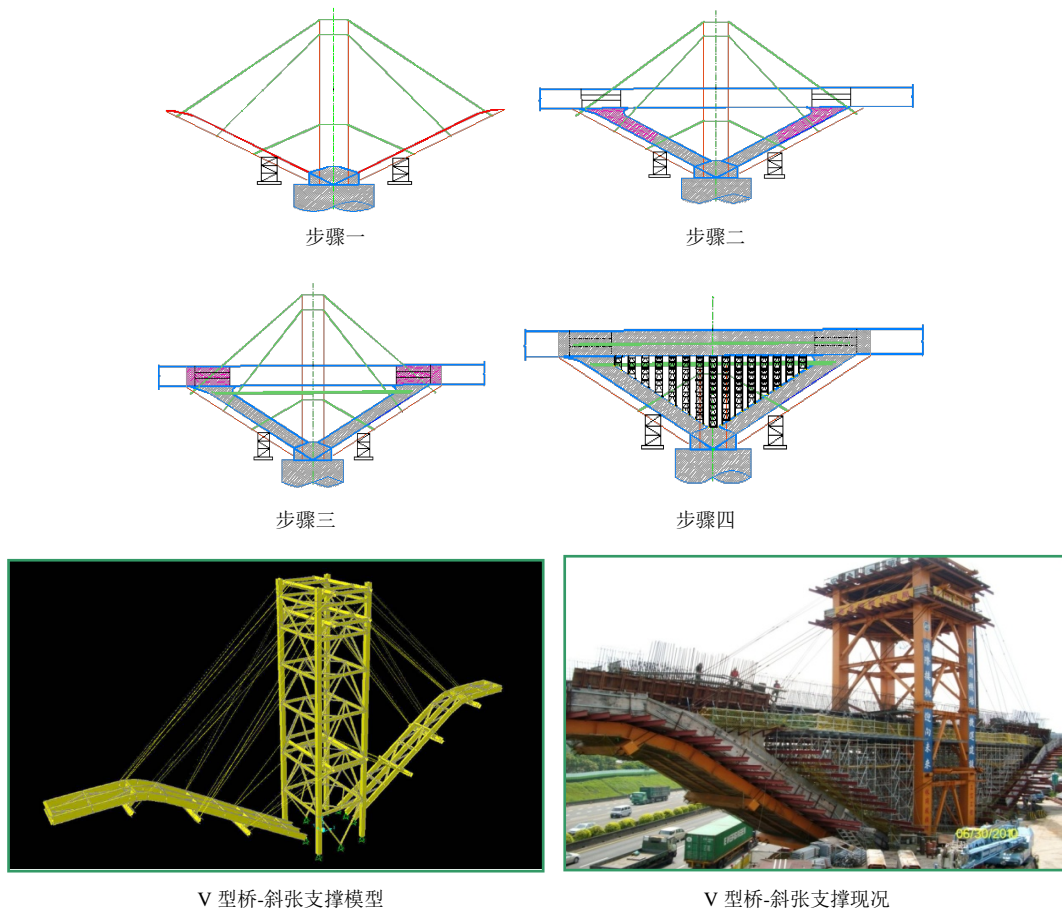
V-type bridge—Pier's construction procedures of stayed supporting steel bridge
